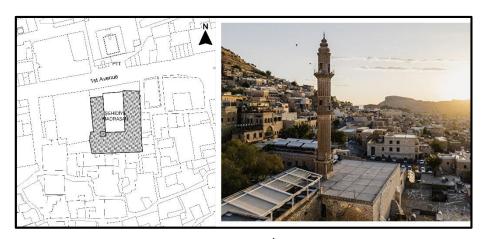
Şehidiye Madrasah Site Plan (İbrahim Duyan Archive) and Aerial Photograph (URL-1)
